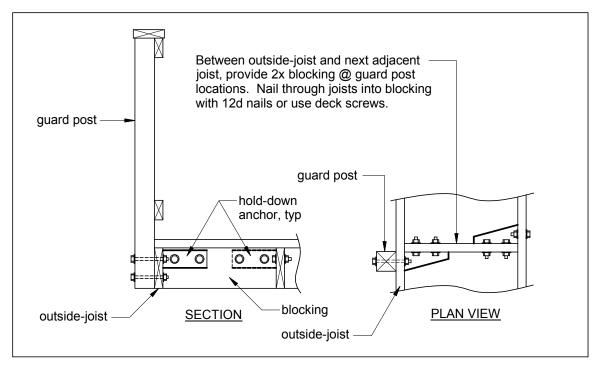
GUARD POST TO OUTSIDE JOIST DETAIL
